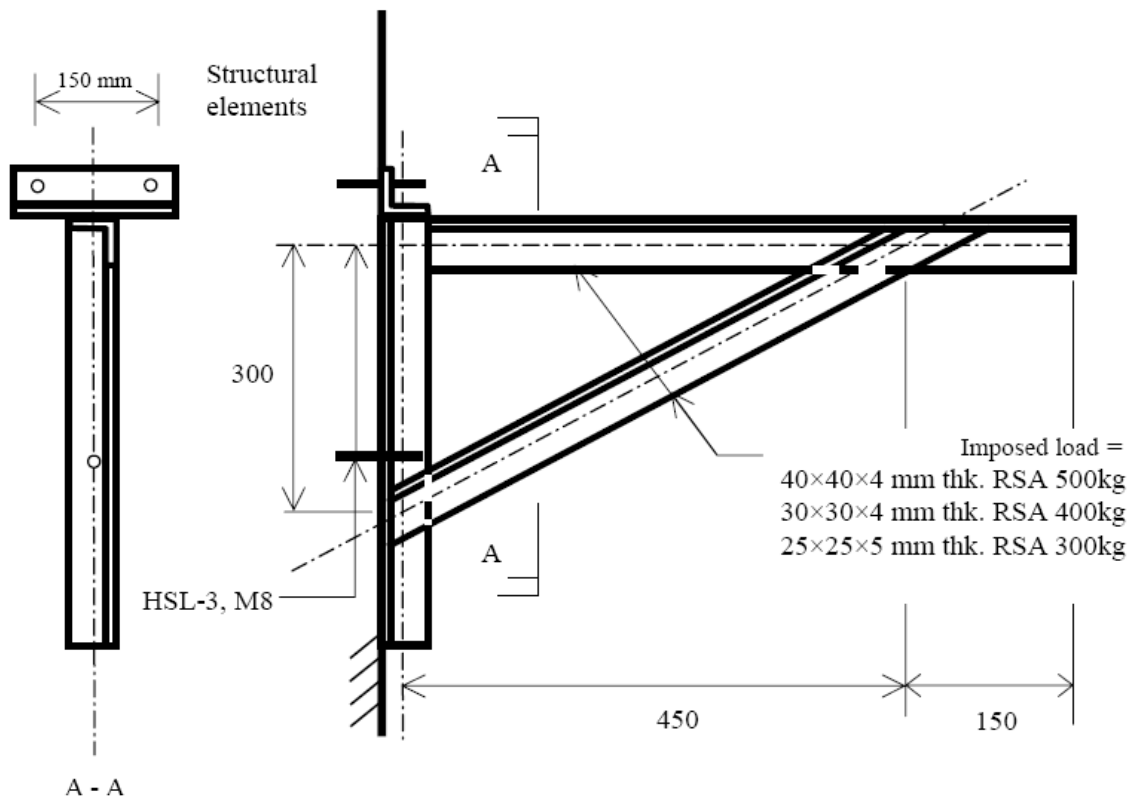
Base support for truss-out scaffold (Adopted from Buildings Department, 2006).
